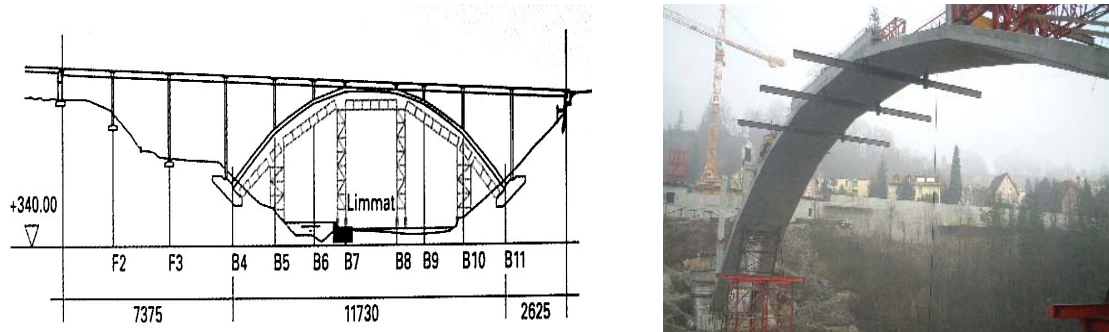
scaffolding during arch construction (left) and finished arch (right)
